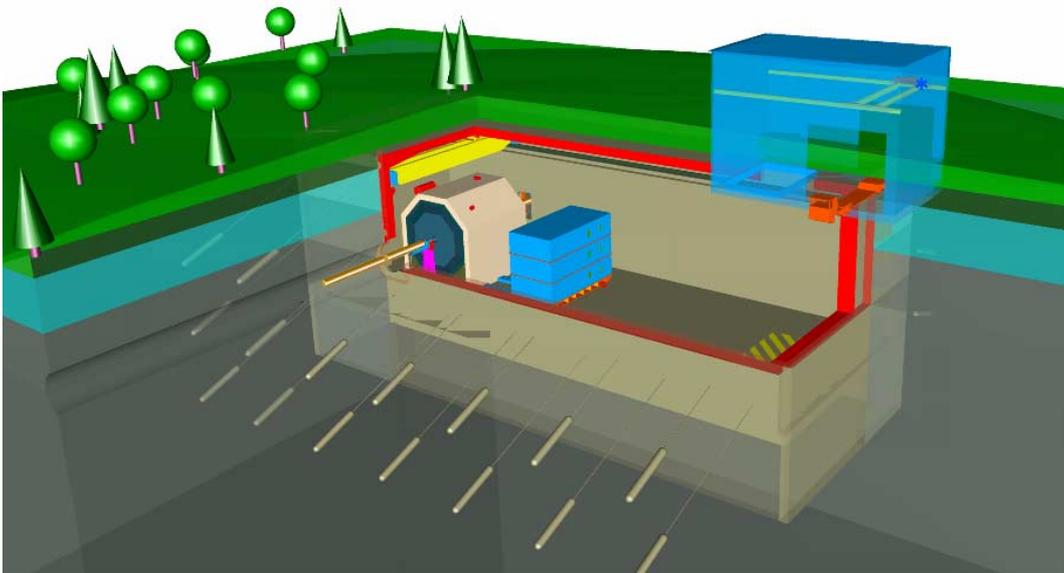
Draft of the experimental underground/entrance hall arrangement.
